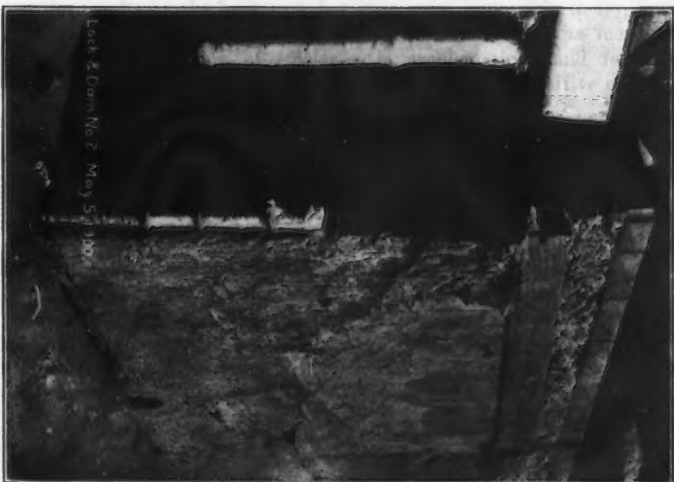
A SECTION PARALLEL TO THE DIAPHRAGM OF BOARDS, AND A FEW INCHES, ONLY, FROM IT.
